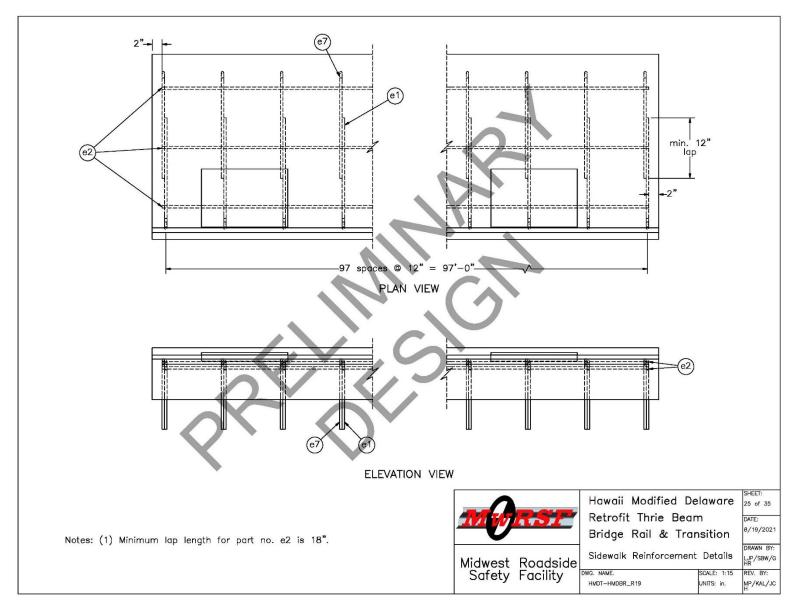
Sidewalk Reinforcement Details, Test No. HMDT-1
